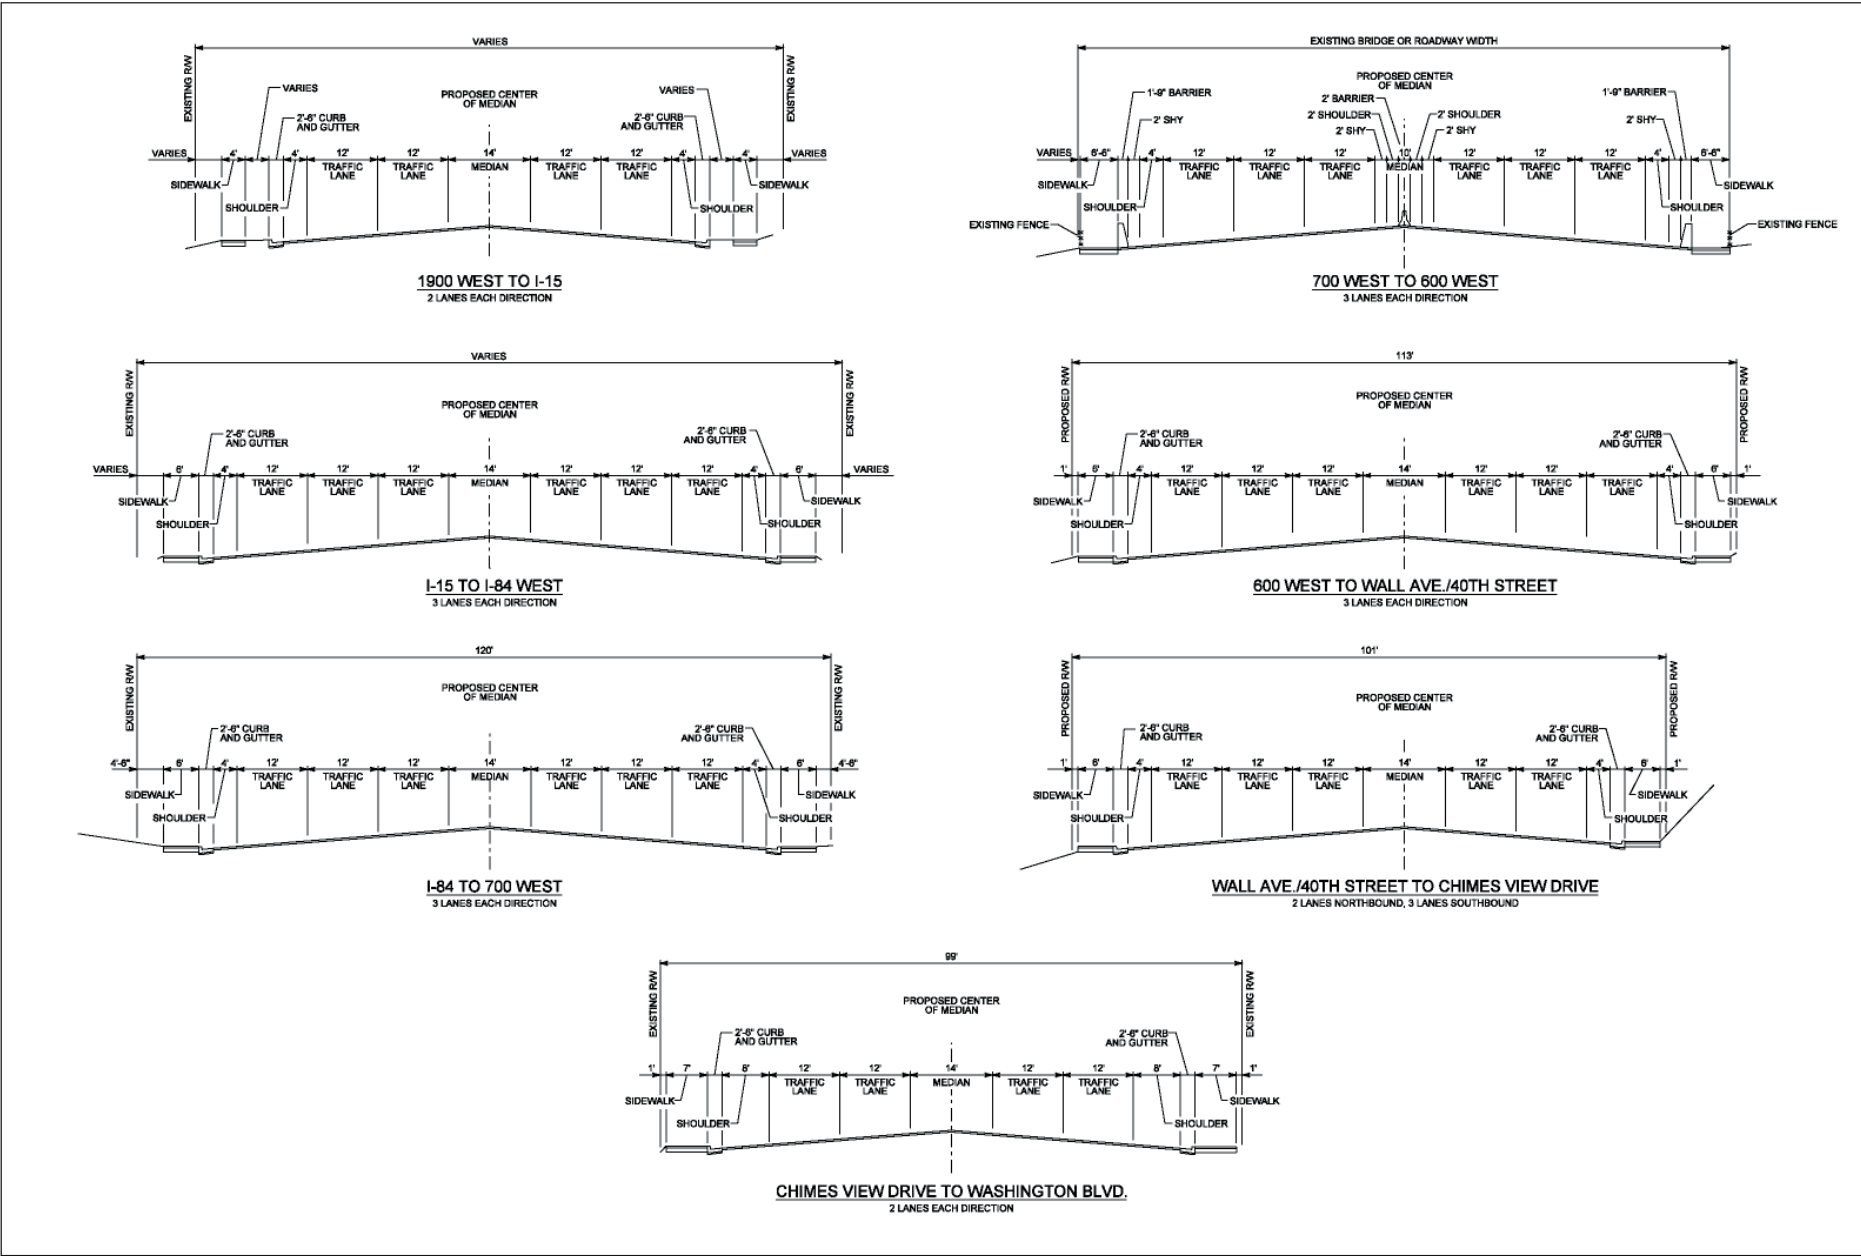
Roadway Typical Section for the Lane Addition Alternative.
